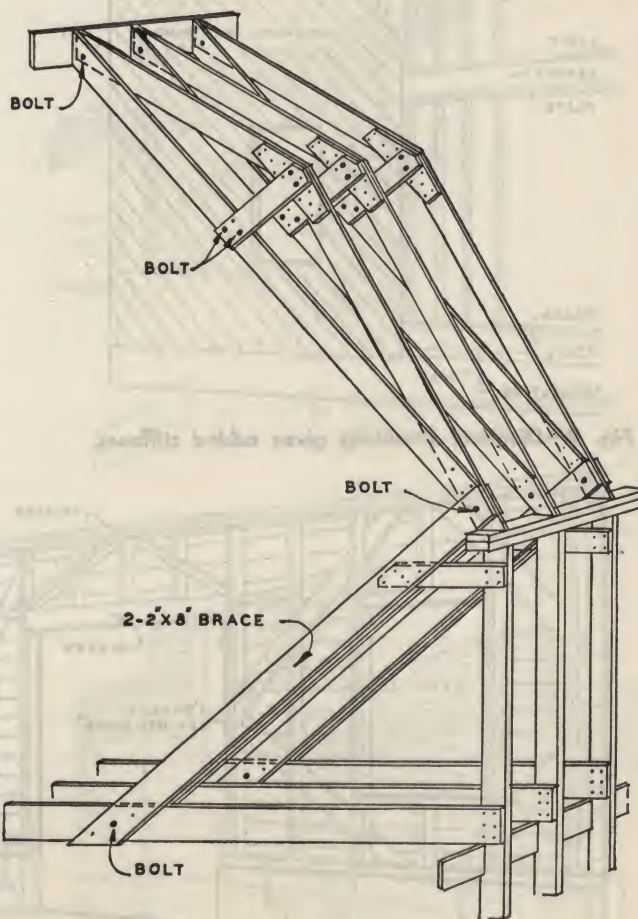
Where plate extends above mow floor, place bracing as shown, bolt and nail securely.
